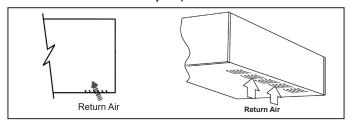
Arrangement 26 - Return Air Bottom Grille/ Outdoor Air Top Duct Collar
